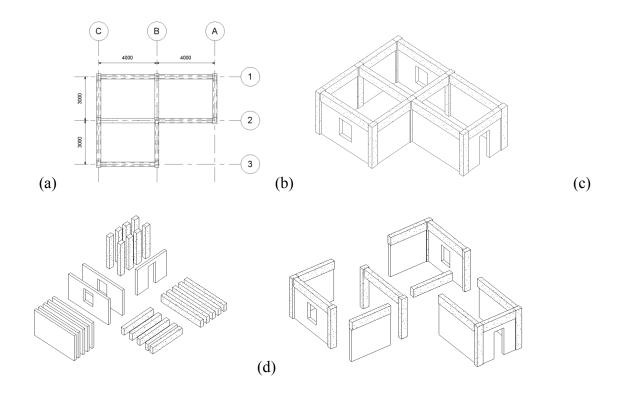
a- Sample building plan, b- Sample building 3D view, c- building elements for conventional prefabrication, d- building components for a sample configuration of building
